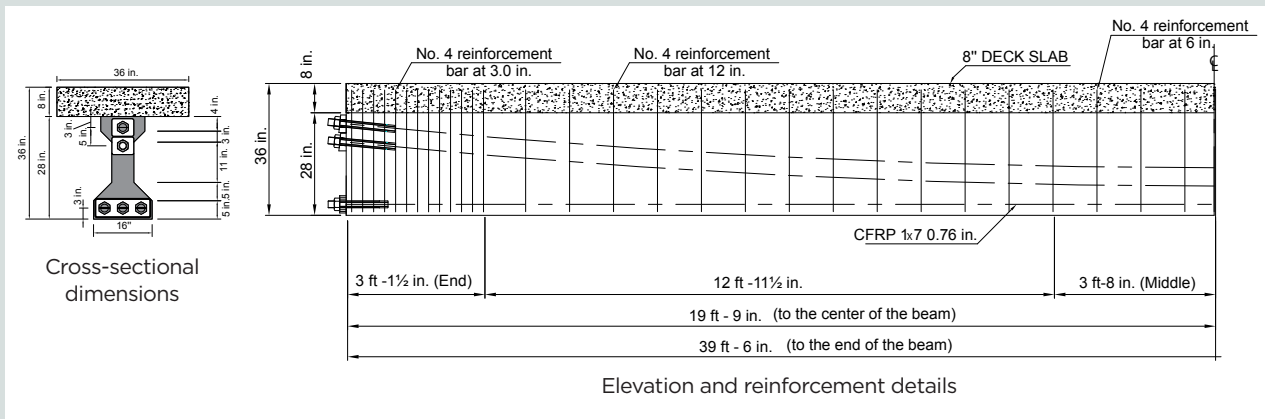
Typical details for full-scale post-tensioned concrete beams with straight and draped cables. Note: CFRP = carbon-fiber-reinforced polymer. 1 in. = 25.4 mm; 1 ft = 0.305 m.
